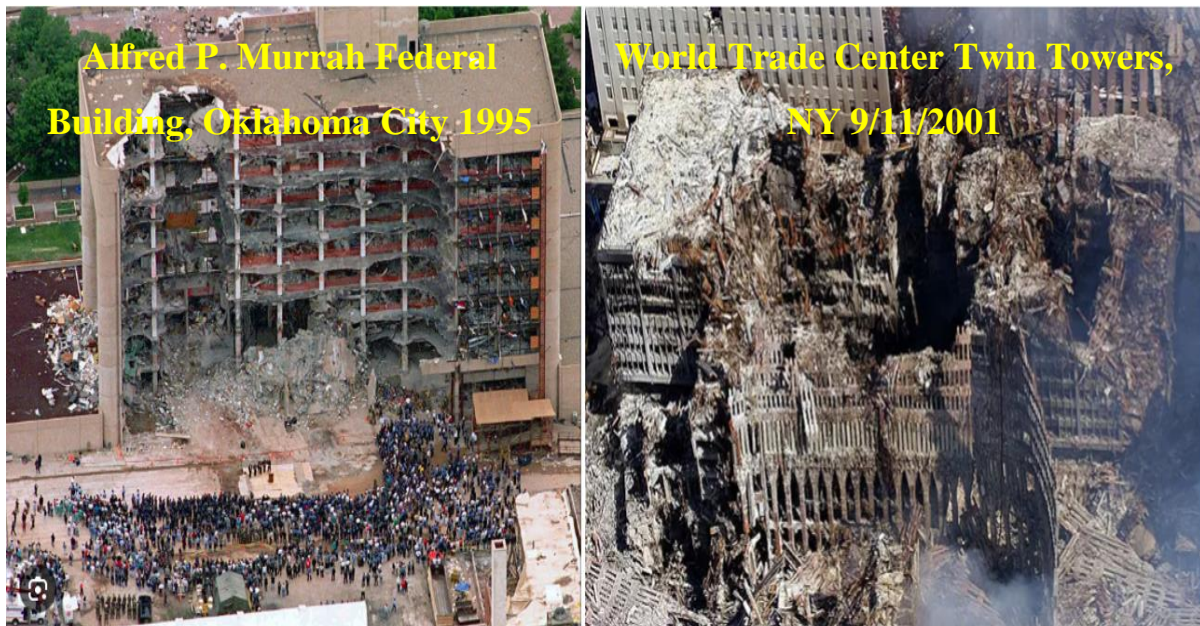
Alfred P. Murrah Building and World Trade Center after Collapse
